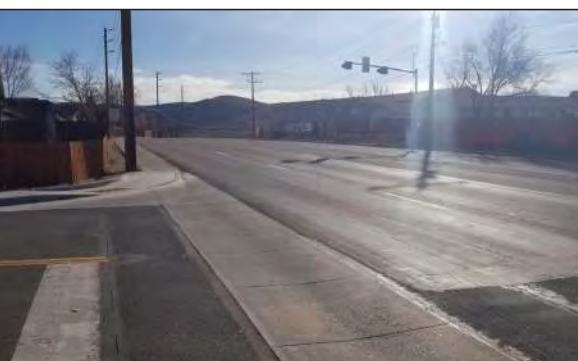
Fairview Drive at Walker Drive, looking south (CS-3)
